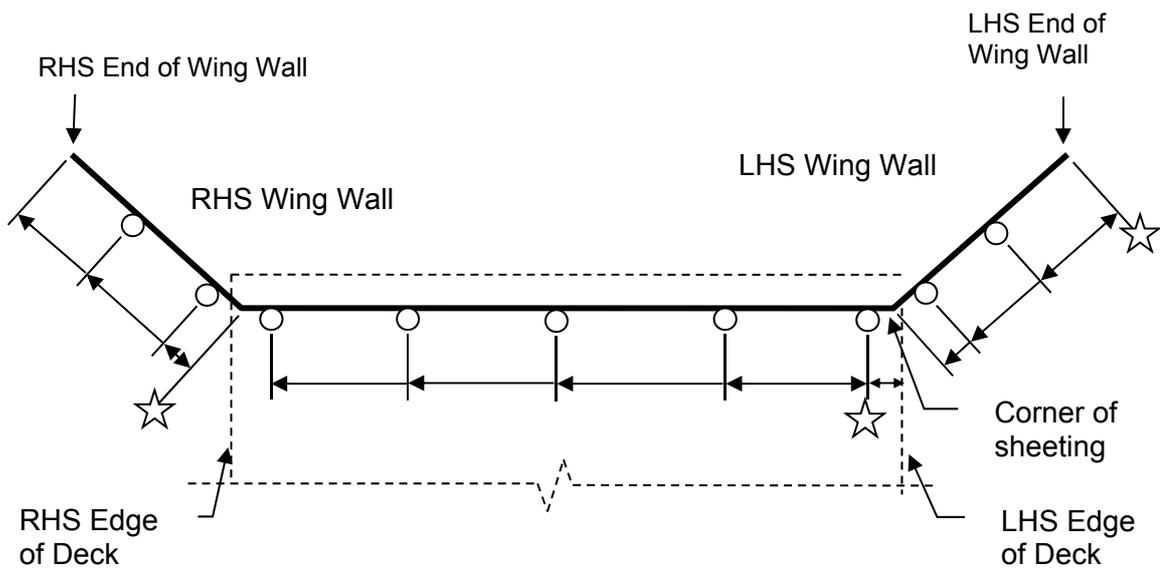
PLAN - ABUTMENT 1, ELEMENT SPACINGS
